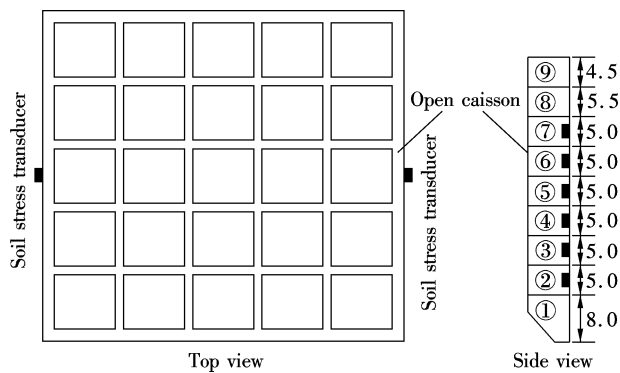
Arrangement of soil stress transducers on the side wall of the open caisson (unit: m)
